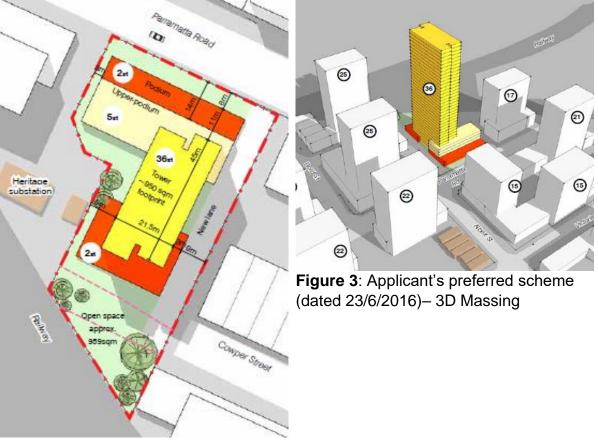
Applicant's preferred scheme (dated 23/6/2016) - Masterplan
